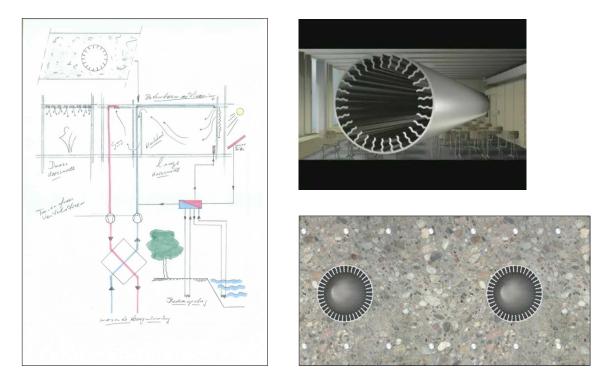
Schematic diagram and detail of the aluminium pipe for concrete core activation with air.
